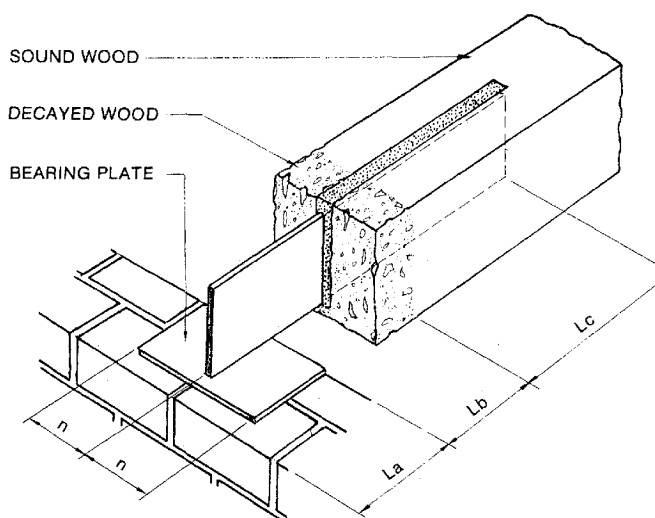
The steel plate transfers the load from the bearing surface to the sound part of the beam. For engineering purposes, it is divided into three lengths: the bearing surface (La), the decayed or missing part of the beam (Lb), and the section of sound wood (Lc). A bearing plate is often used to spread the load, and wooden blocking is recommended to cover any exposed steel.
